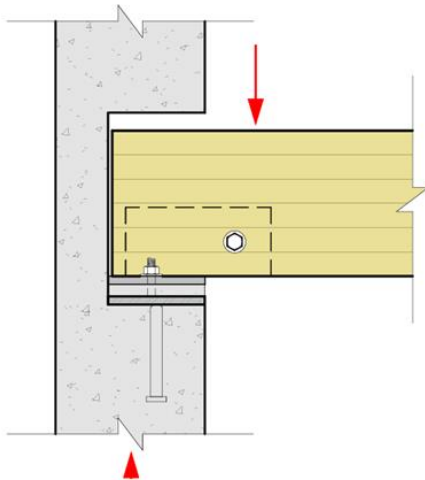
Connection glulam beam in recess in concrete wall [82]
